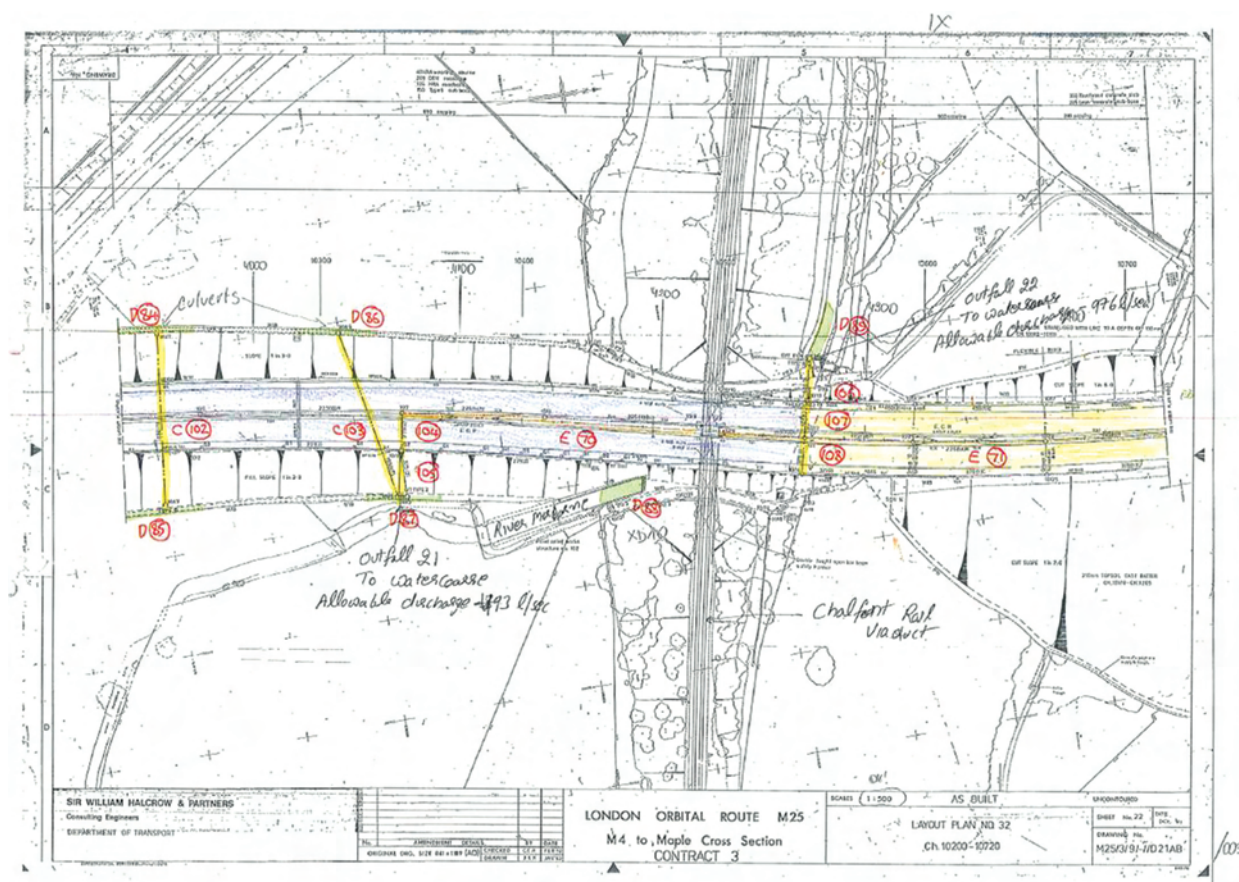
Drainage as-built information at Chalfont Railway Viaduct
